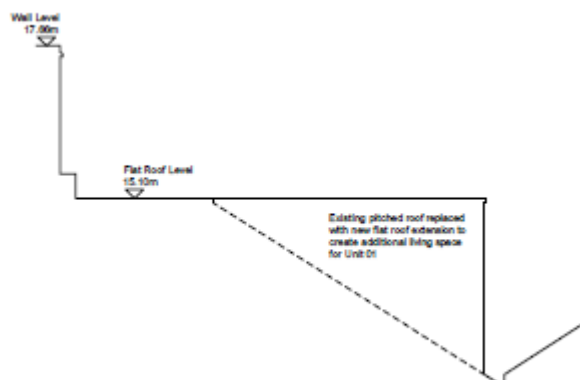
Southwest Elevation proposed – showing extension at second floor level
